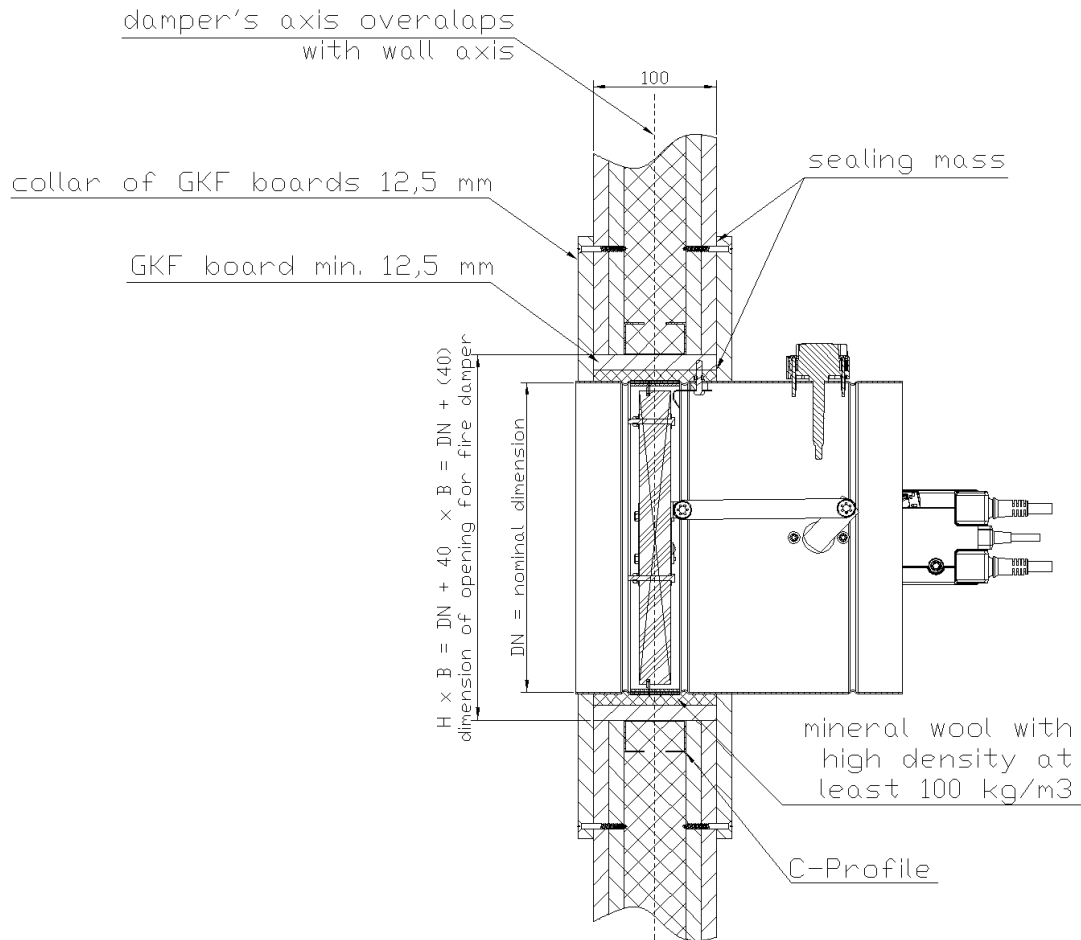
Installation method of fire dampers KTM-O in flexible wall with 100 mm thickness
